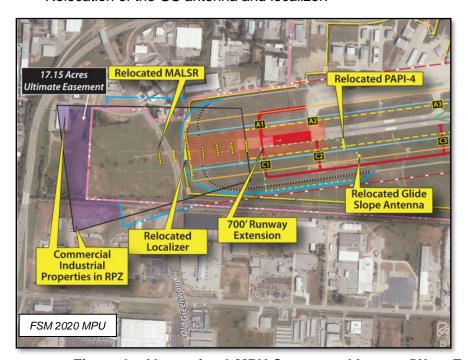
Alternative 2 MPU Conceptual Layout (West Extension)
